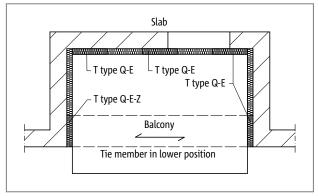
Schöck Isokorb® T type Q-E, Q-E-Z: Recessed balcony supported on three sides with tie member
